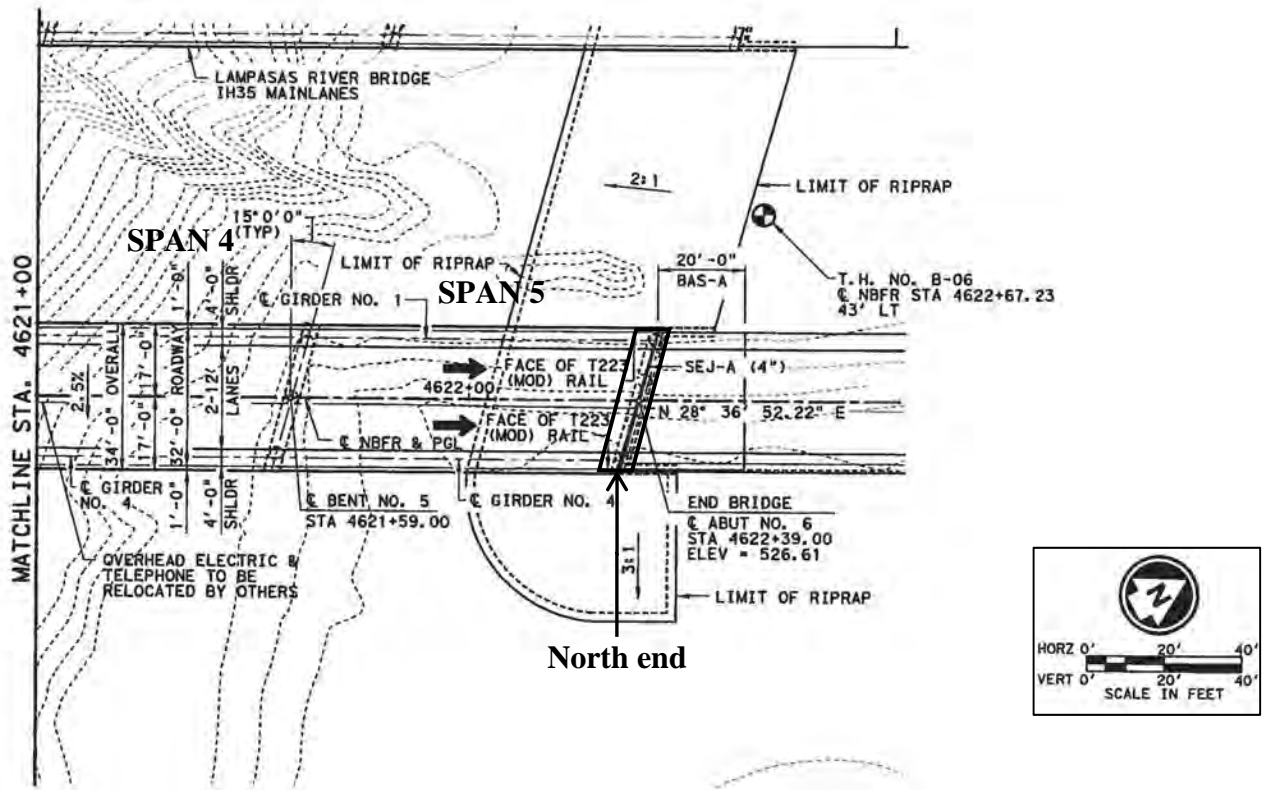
Plan view of Lampasas River Bridge (Spans 4 to 5)
